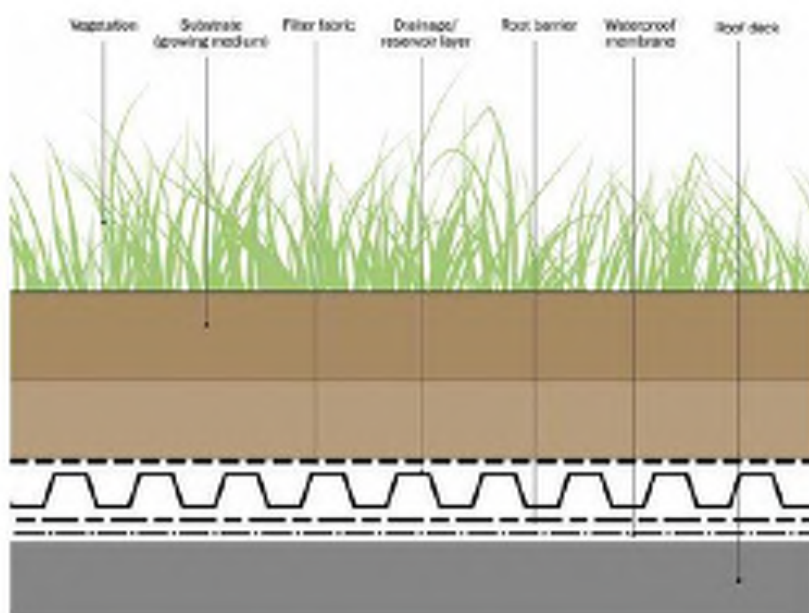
Typical Green Roof Detail (Source: SuDS manual - Figure 12.1)
